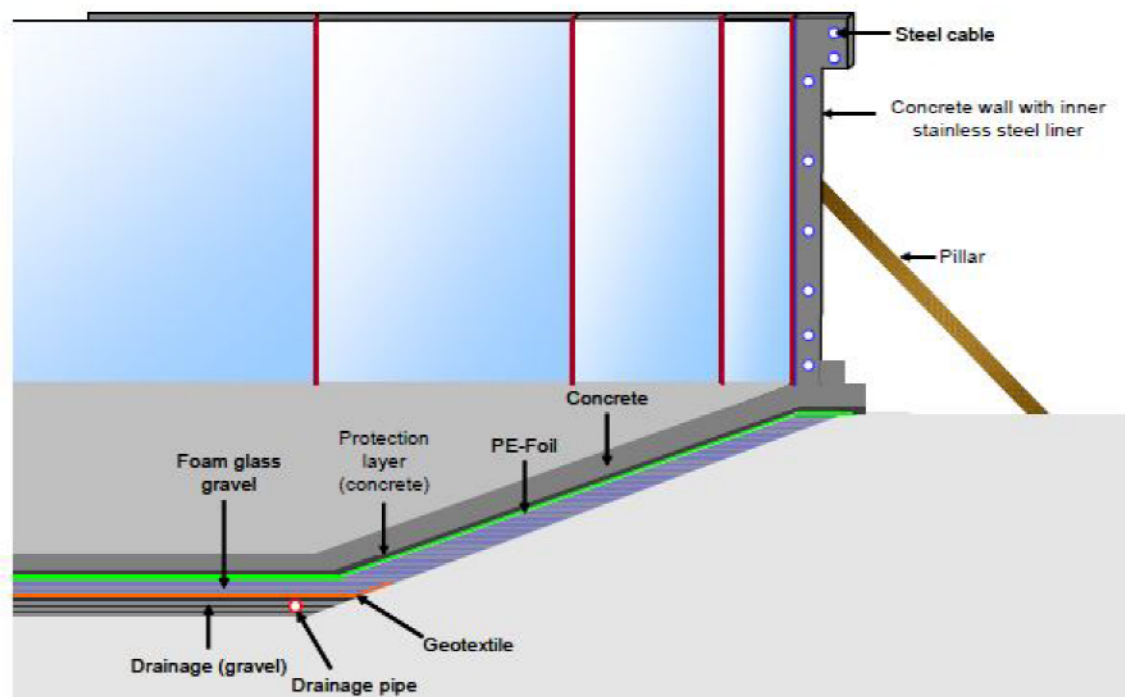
Cross-section with structural details (Schmidt & Mangold, 2006)
